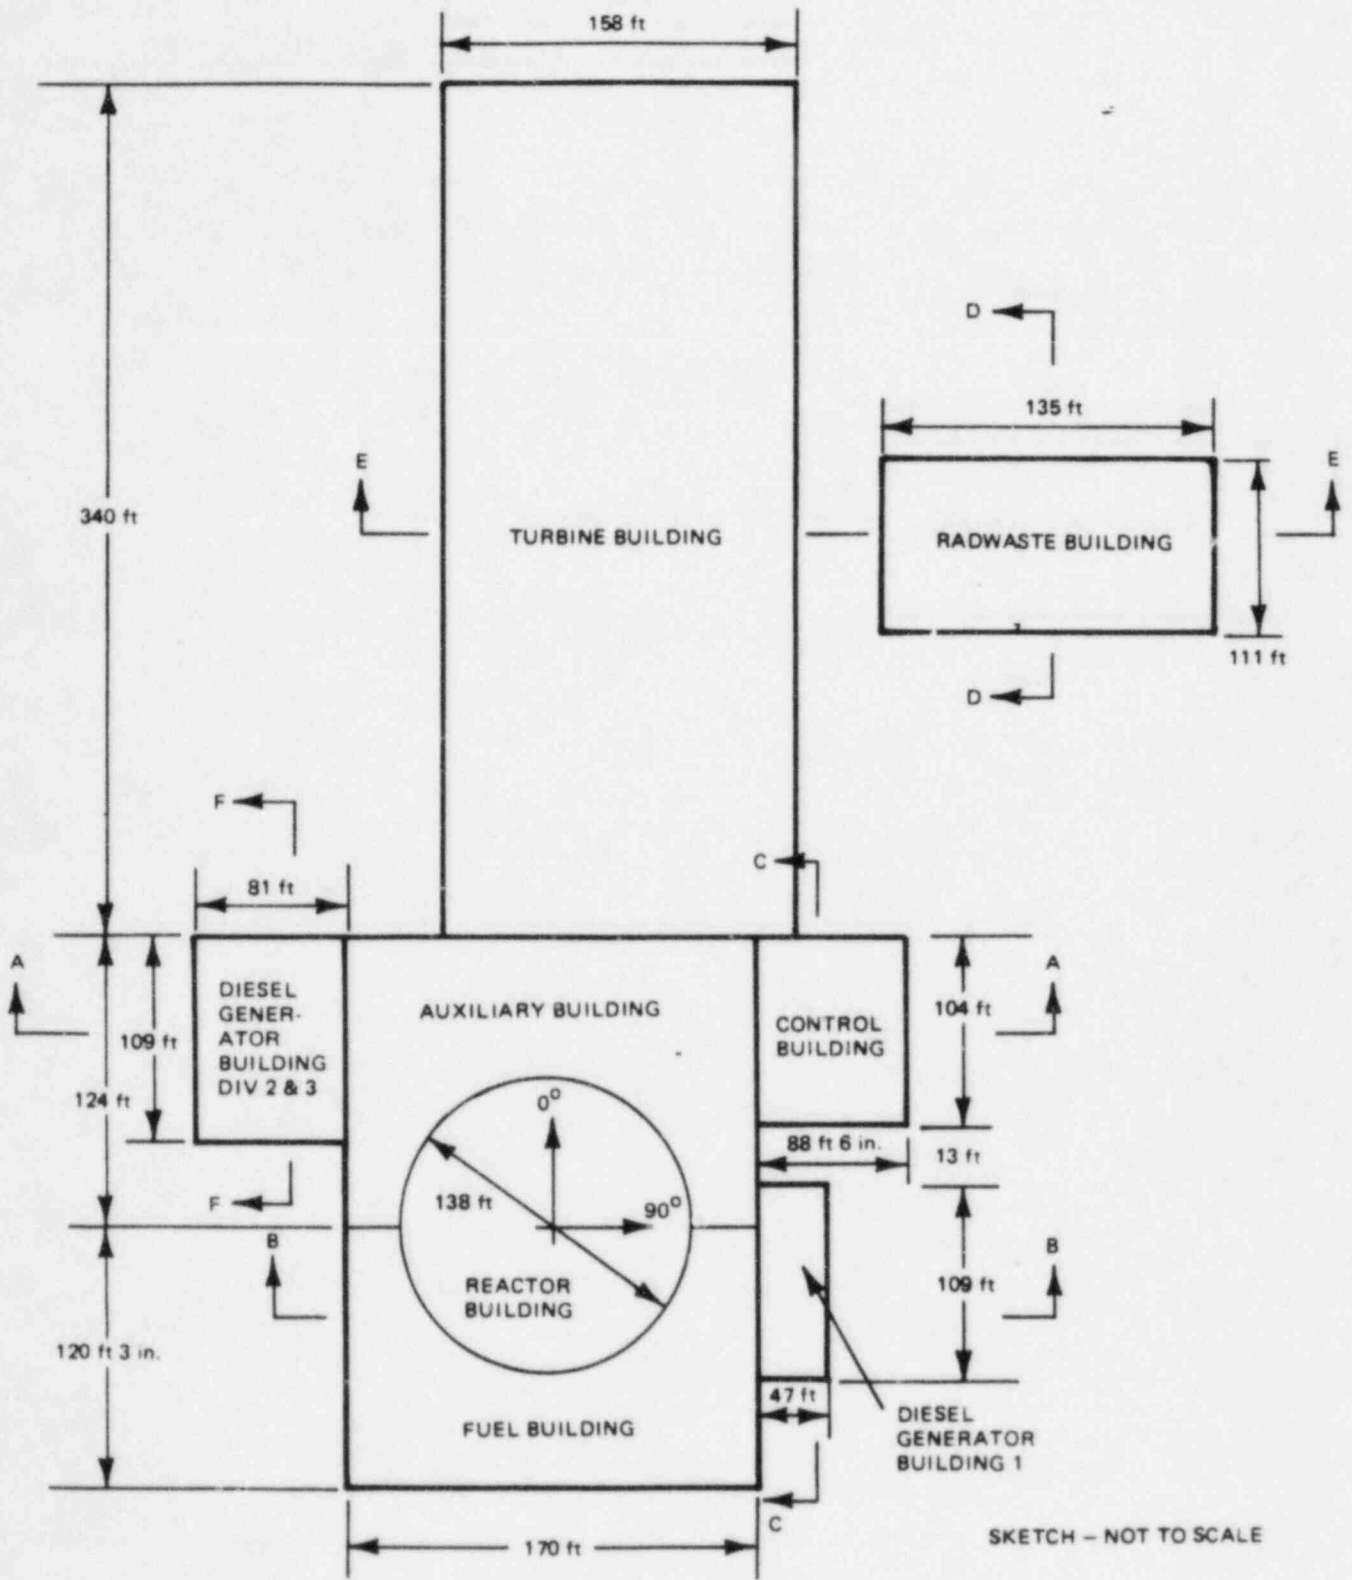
A-8. Plan View of Nuclear Island and Turbine Building Arrangement
